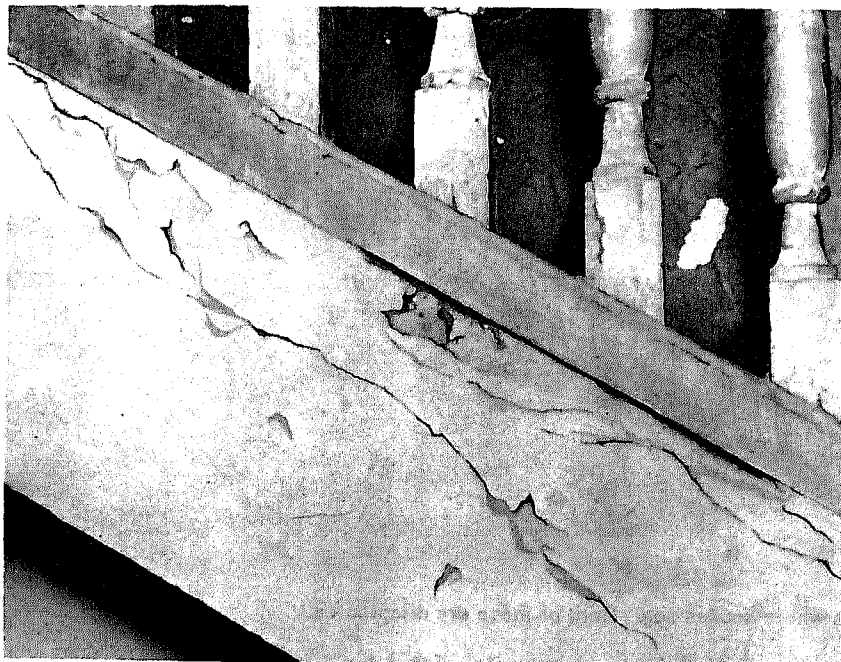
Inside the house you see other intermediate defects such as broken and missing material in the stairway. When a house needs extensive repairs, it is dilapidated.
